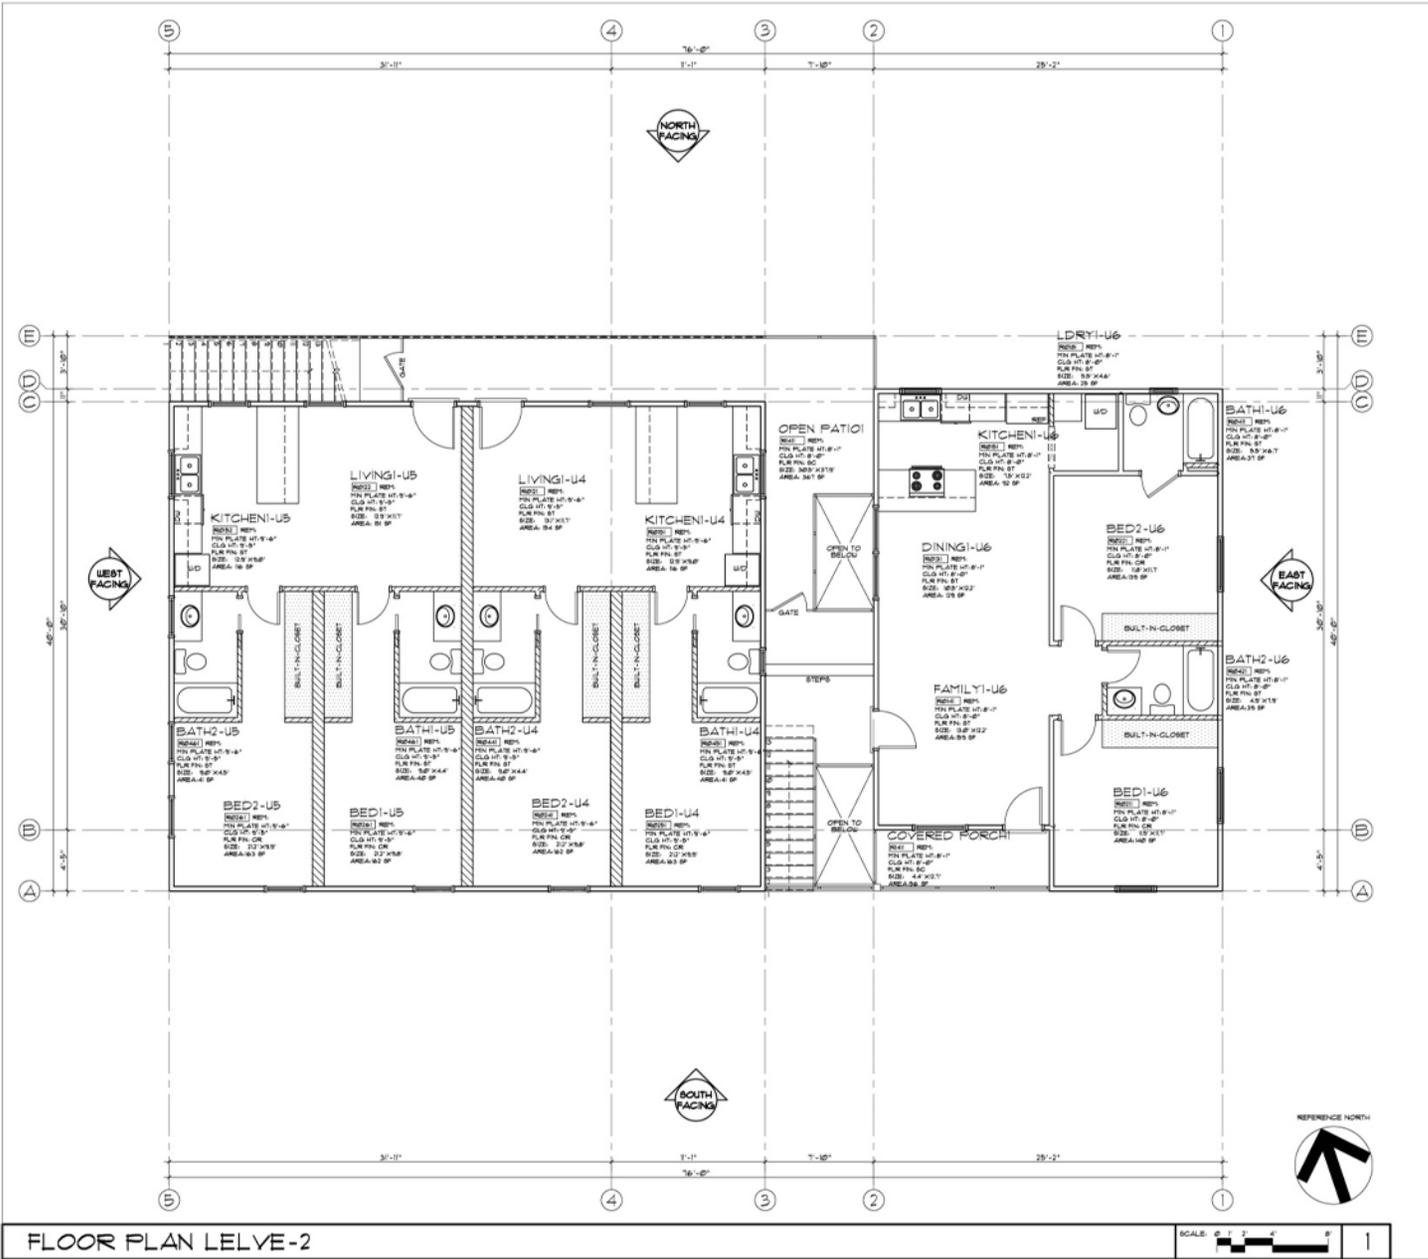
Exhibit C – Proposed Floor plan 2<sup>nd</sup> Floor
